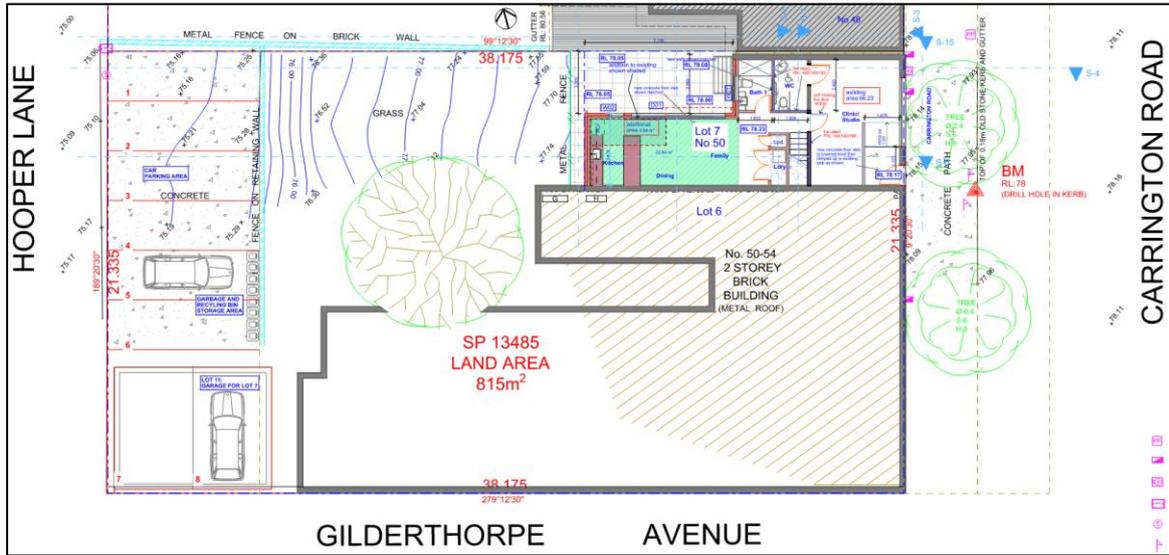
Site Plan - DA/4/2022 - 50-54 Carrington Road, Randwick NSW 2031
